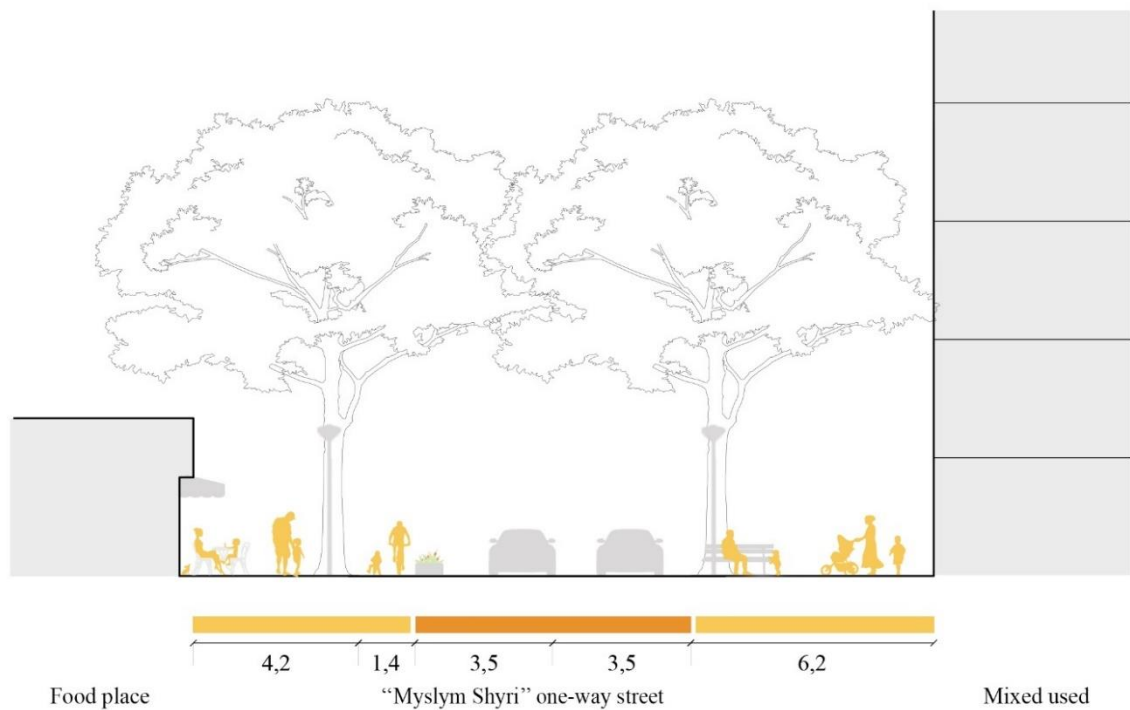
Proposed extension of businesses providing frontage zone, addition of urban furniture for facilitating resting and play
